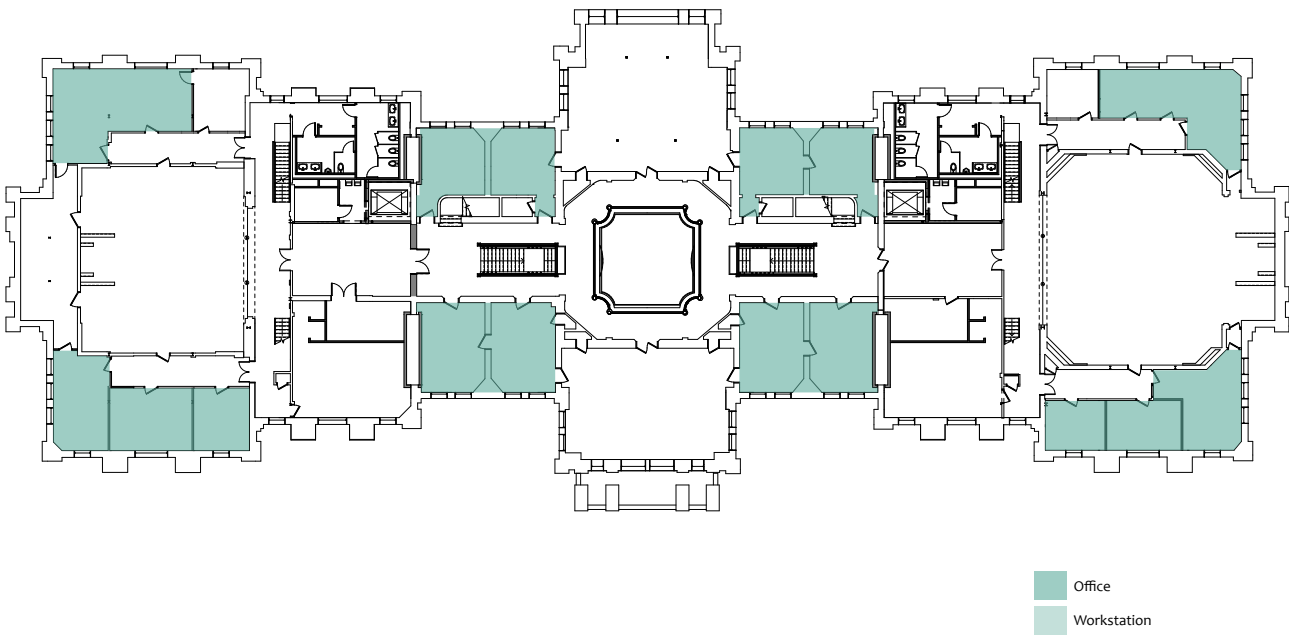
Proposed Office and Workstations - Second Floor[Capitol]
